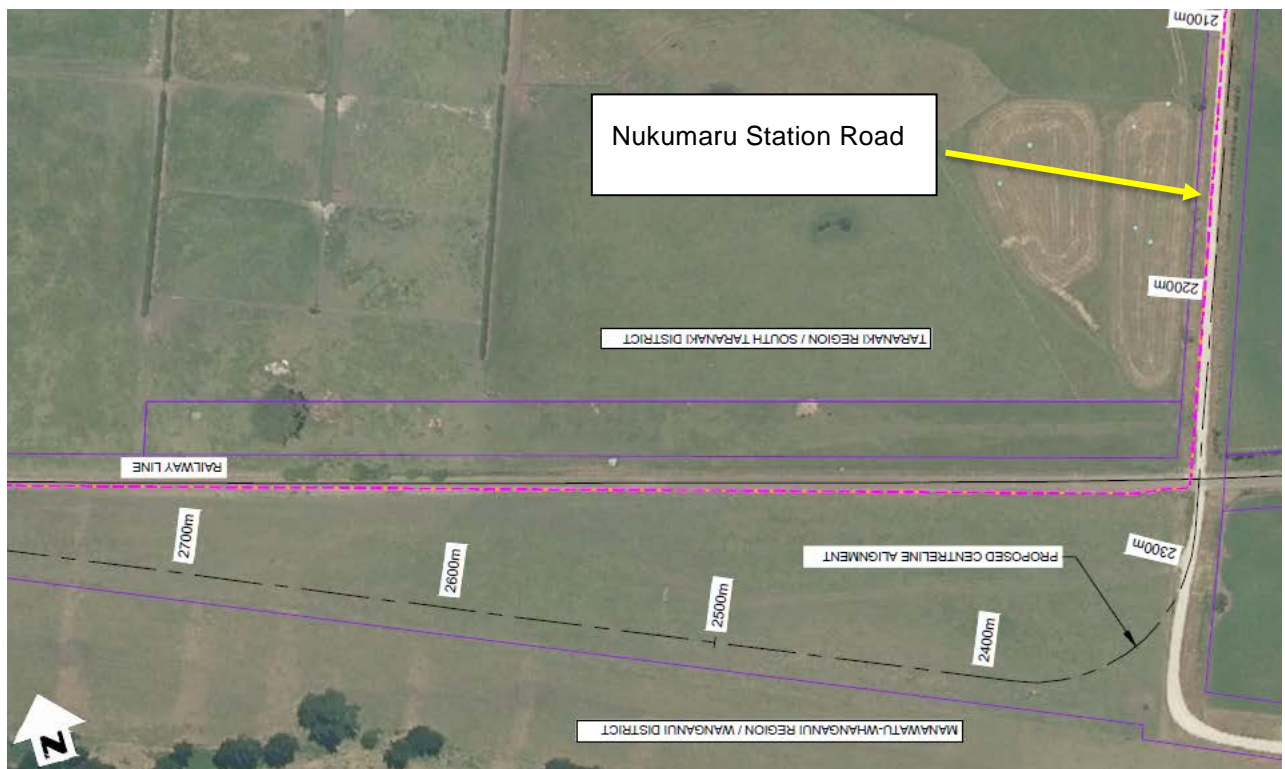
Nukumar Station Road Extension Proposed Alignment
